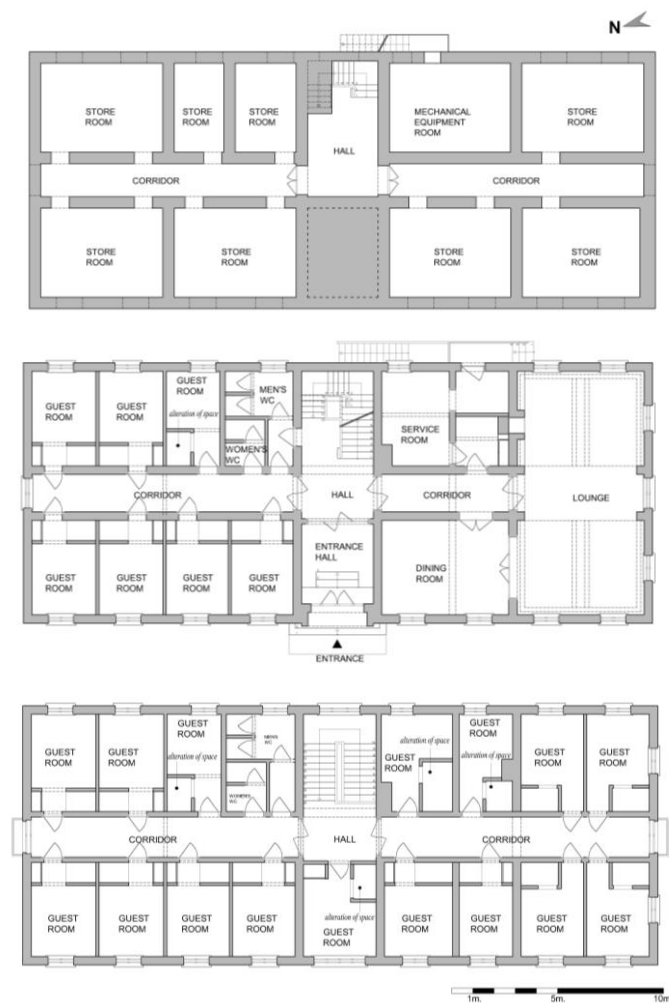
Basement, ground and first floor plans of Old Guesthouse
